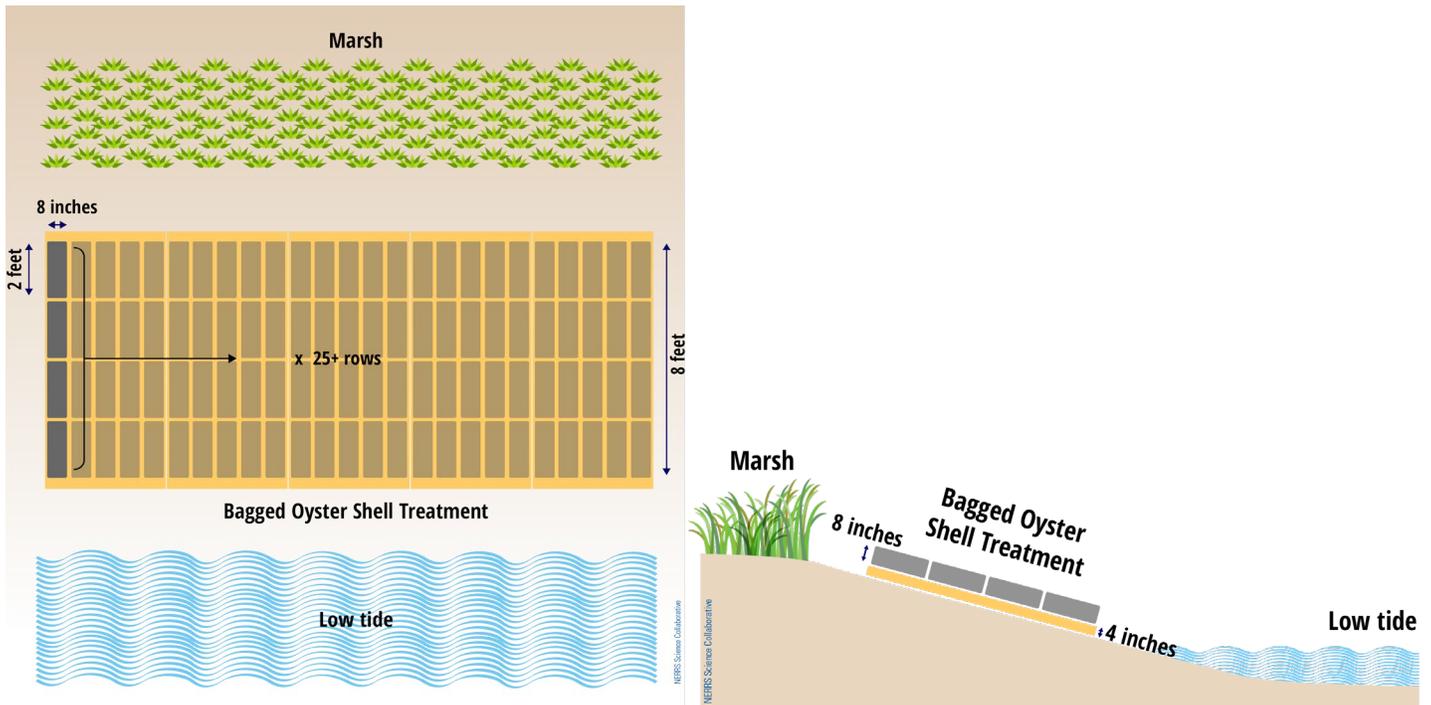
Overhead (left) and cross section (right) of a typical bagged oyster shell reef design with shell bags placed atop wood pallets.
